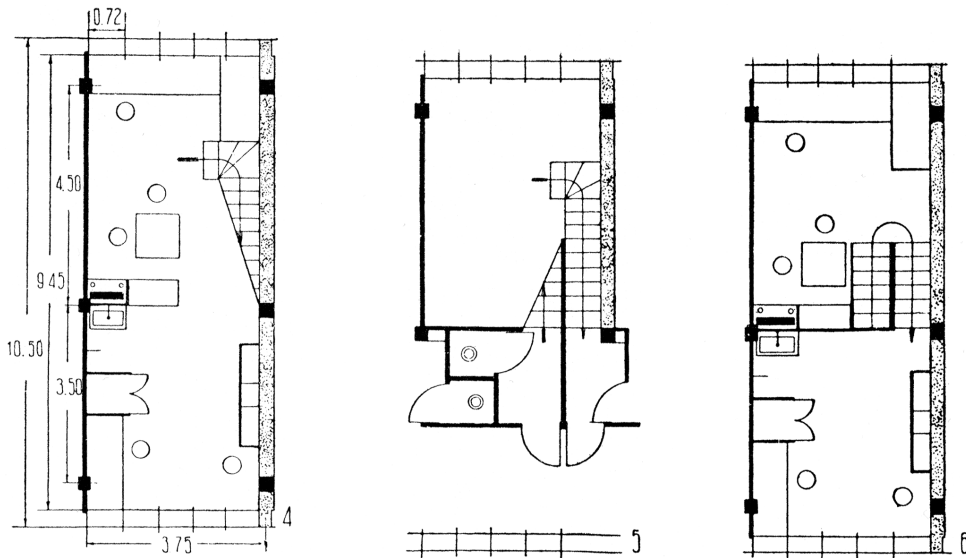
Collective housing at the Narkomfin: the central floorplan depicts the entrance level to two F-type apartments. Moisei Ginzburg, the Narkomfin, 1932. Source: Moisei Ginzburg, Жилище (Dwelling), USSR: Gosstrojizdat, 1934.
